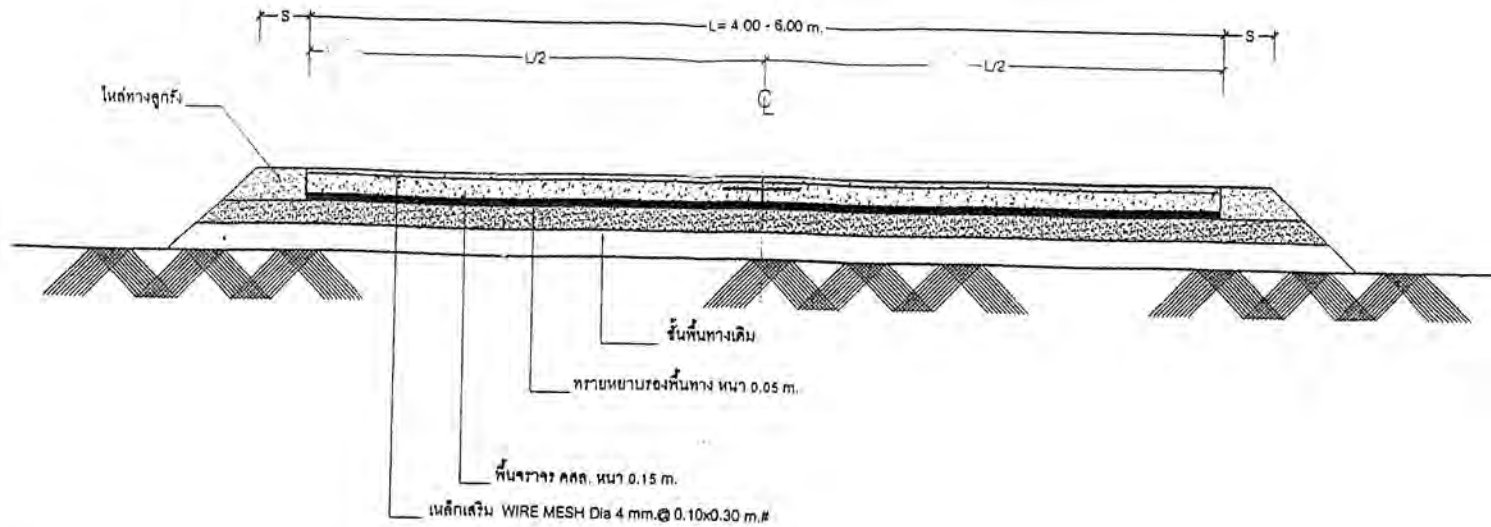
LONGITUDINAL JOINT (รอยต่อตามยาว)
